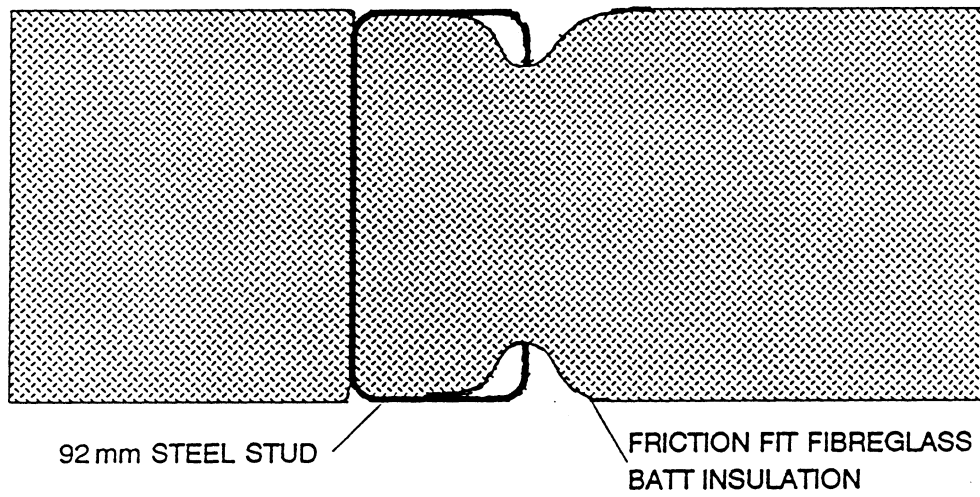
Section Showing Fit of Batt Insulation Around Return on Stud Flange
